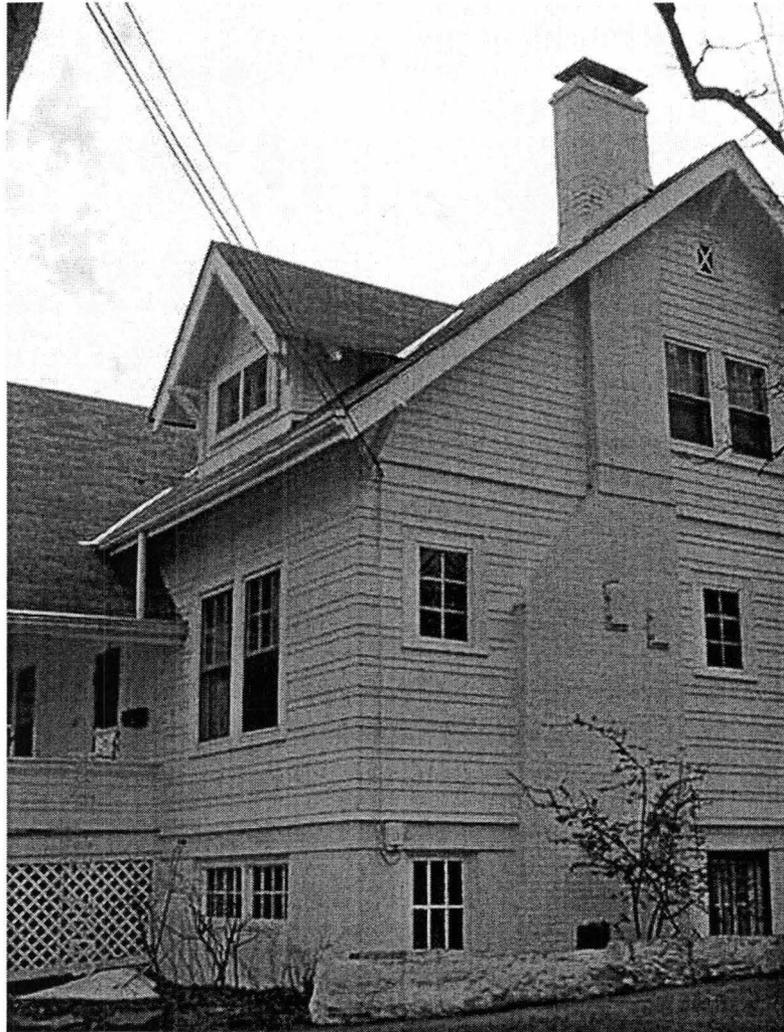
Detail of brick exterior end chimney on the right elevation of 102 North Fillmore Street. Note the three fireplace clean out doors, one at the basement level to the left of the shrub and two at the level of the first floor windows; photograph by author, March 2003.
